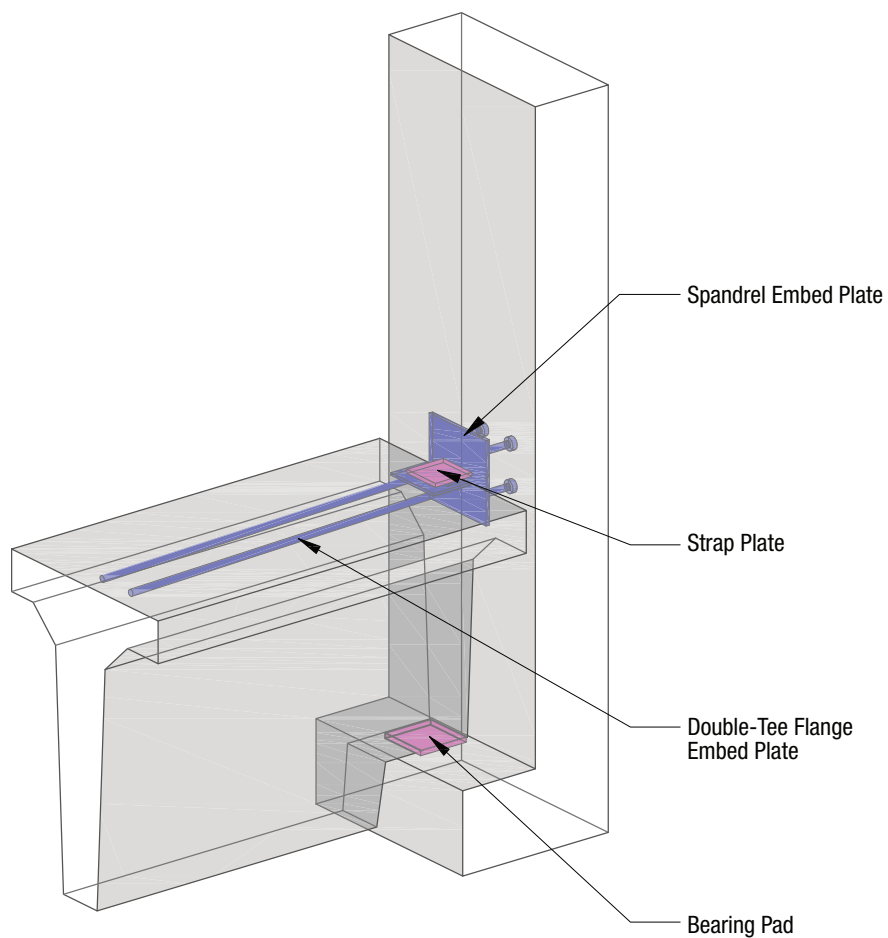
Tee to Loadbearing spandrel Beam with Ledge
